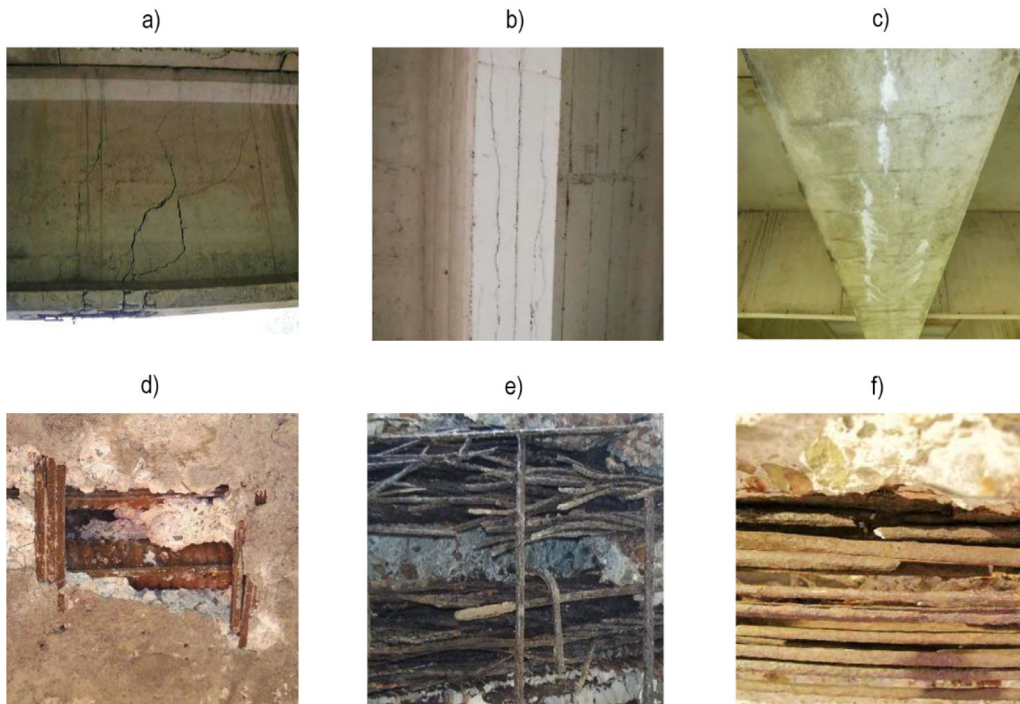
Prestressed bridge damage occurrence: (a) transverse cracks; (b) longitudinal cracks; (c) traces of humidity with efflorescence on the intrados; (d) cavity on the intrados; (e) cables with strands interrupted at the intrados; and (f) corroded and broken wires. (Images courtesy of ANAS Gruppo Ferrovie dello Stato Italiane.)
